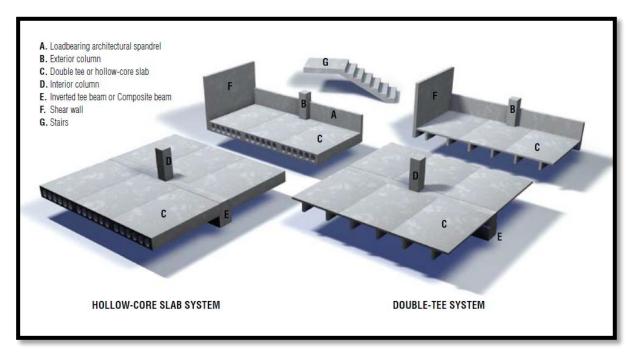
Common Component Systems in Prestressed Concrete Design (Foster et. al., 1997)
